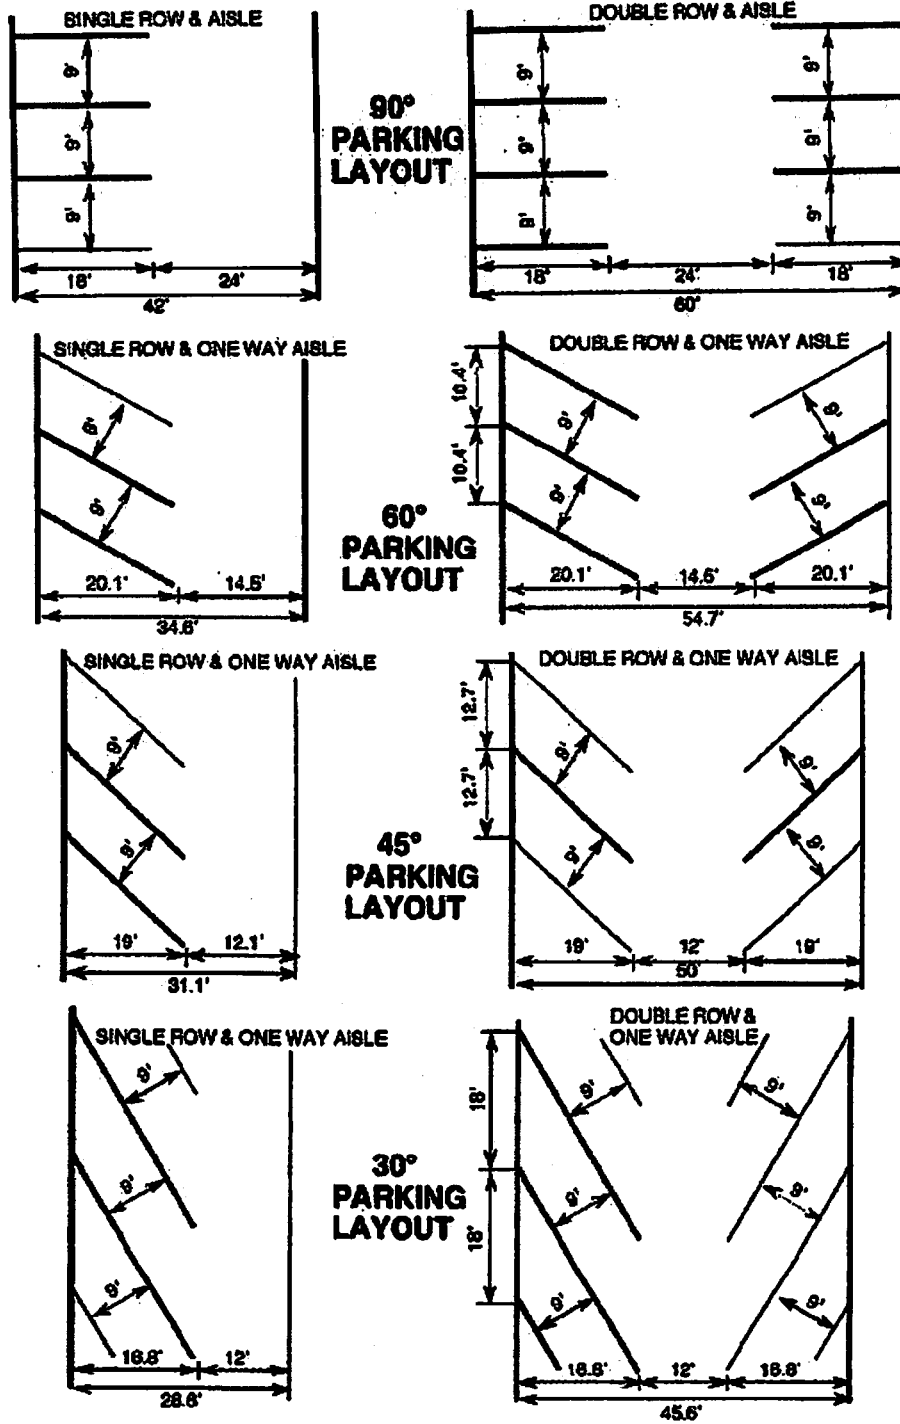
Typical Parking Lot Layouts and Dimensions
